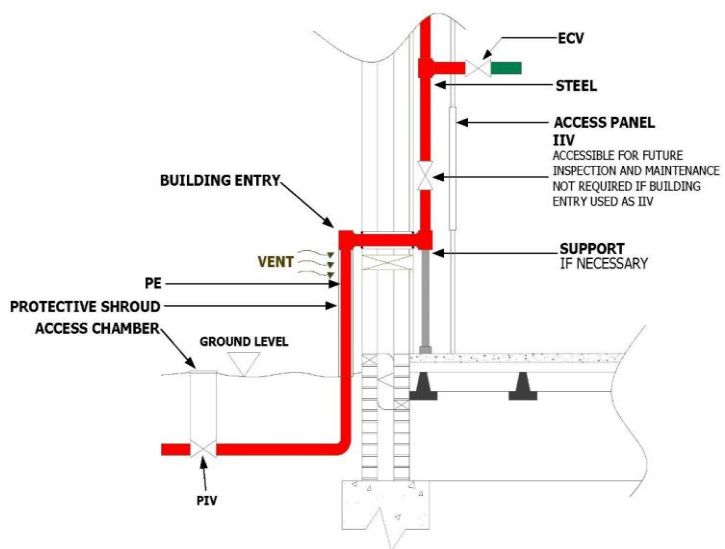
TYPICAL ABOVE-GROUND PIPELINE BUILDING ENTRY (PE PIPE UP TO BUILDING ENTRY)
